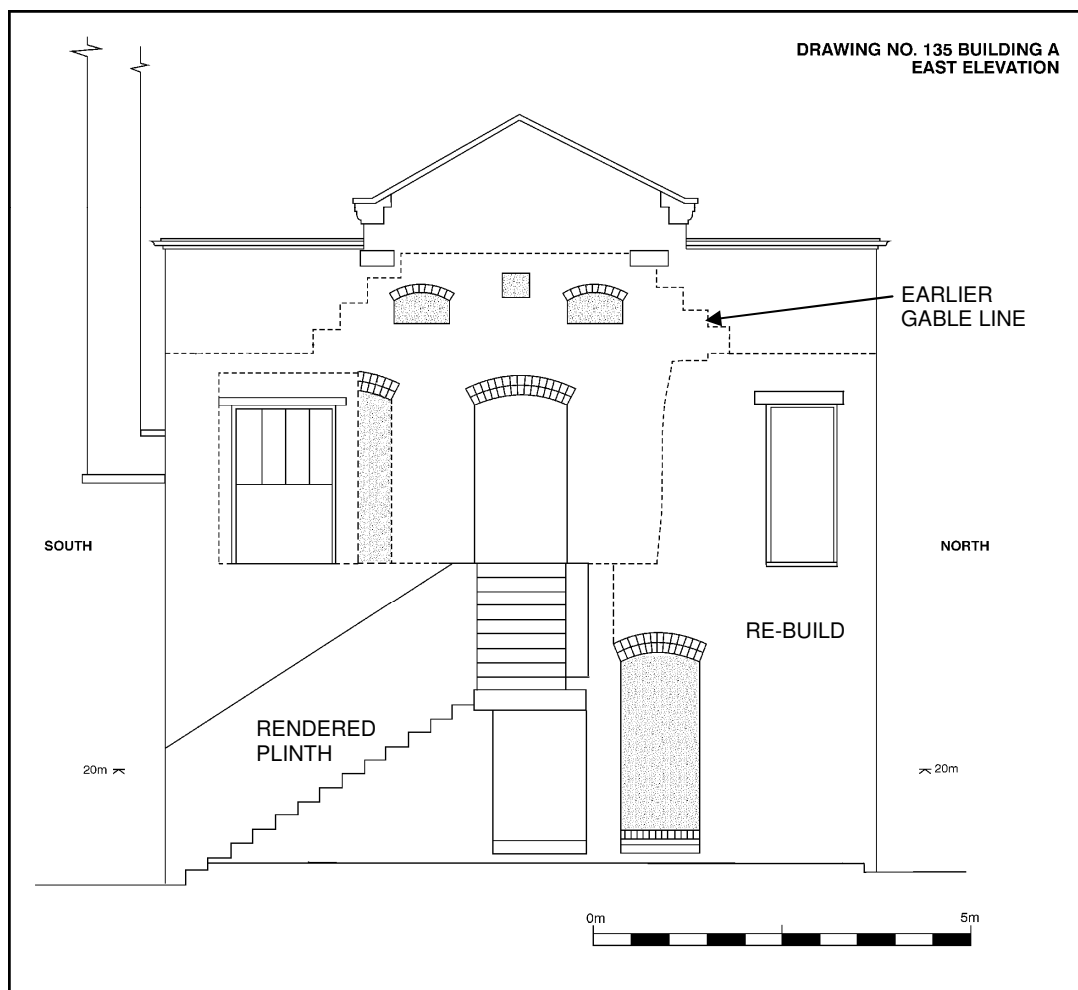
Survey drawing of the east elevation of Building A (scale 1:100)
